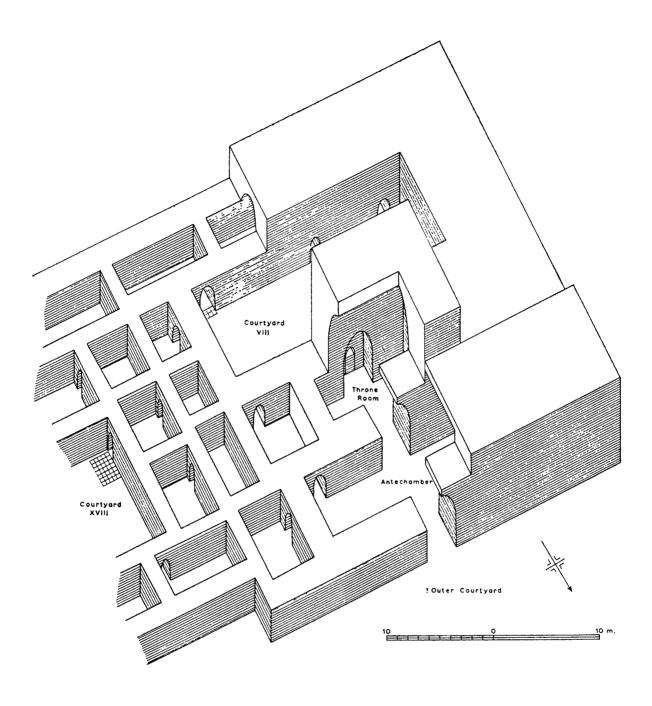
Site C Axonometric reconstruction of the western block of the Palace
